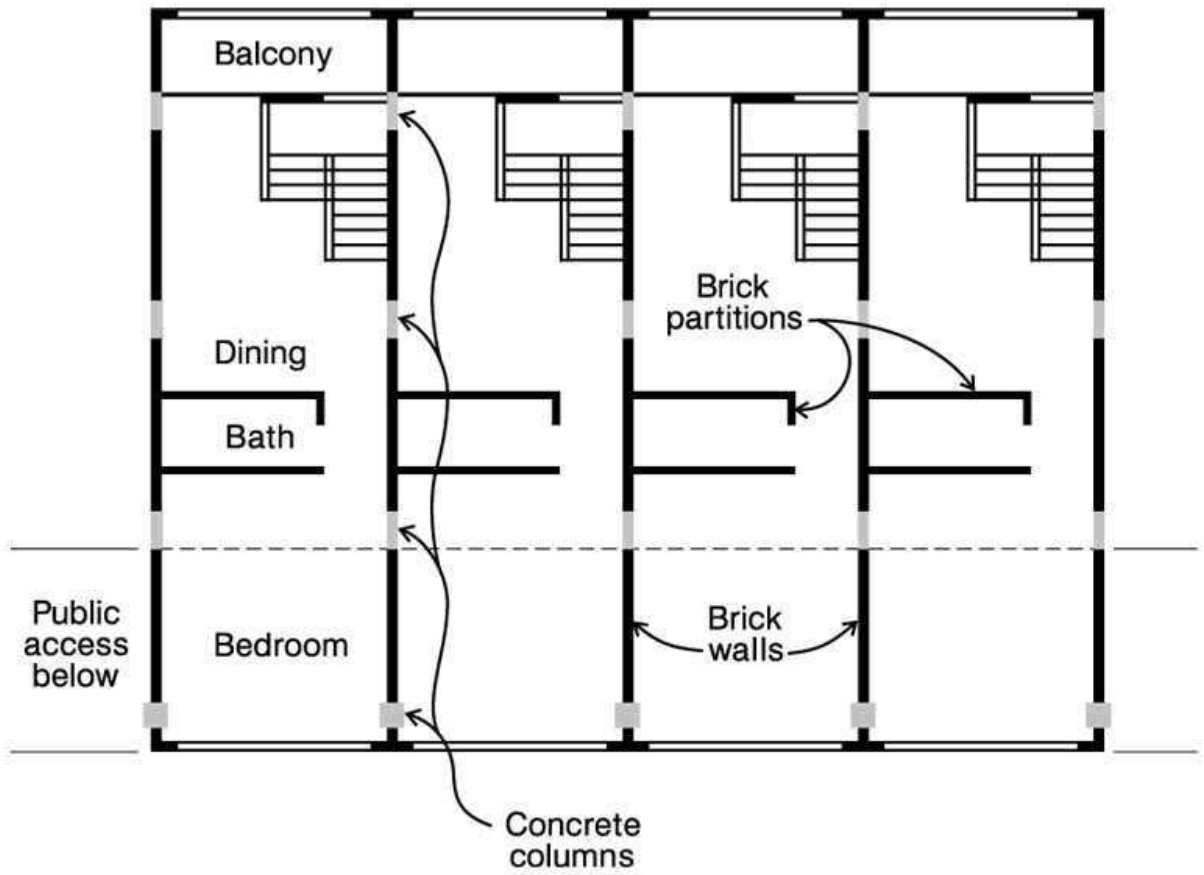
C: Plan of a Typical Building - Upper Floor Levels (Source: EERI 2001)
